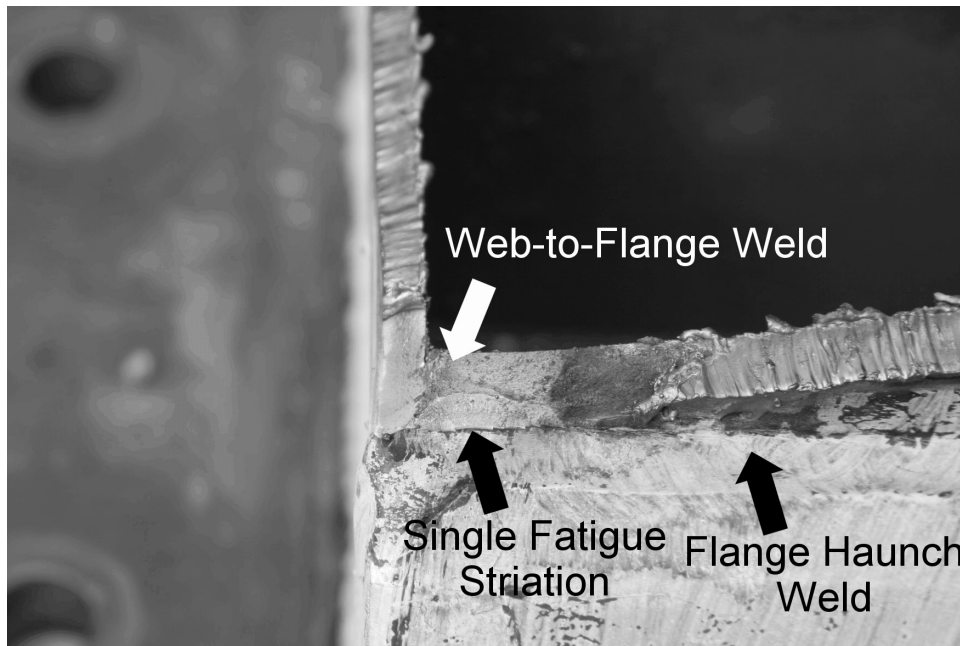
Fracture Surface of Top East Flange of Specimen X1L3.0
